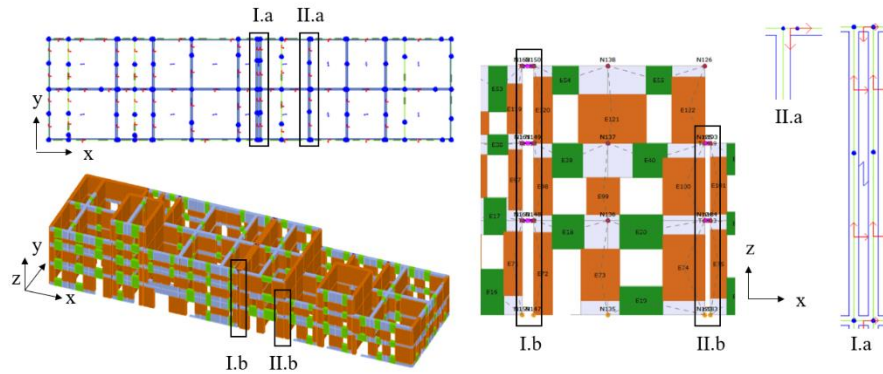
Equivalent frame model of the aggregate. I.a and I.b: Plan and elevation details, respectively, between SU_D and SU_E, which are adjacent. II.a and II.b: Plan and elevation details, respectively, between SU_C and SU_D, where SU_C is leaning against SU_D.
